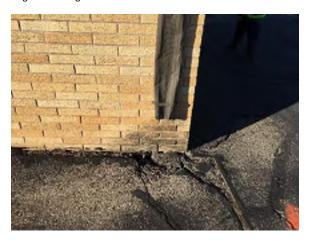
Gutter discharging water into void between asphalt and building. Patch asphalt and drain water away from building.
